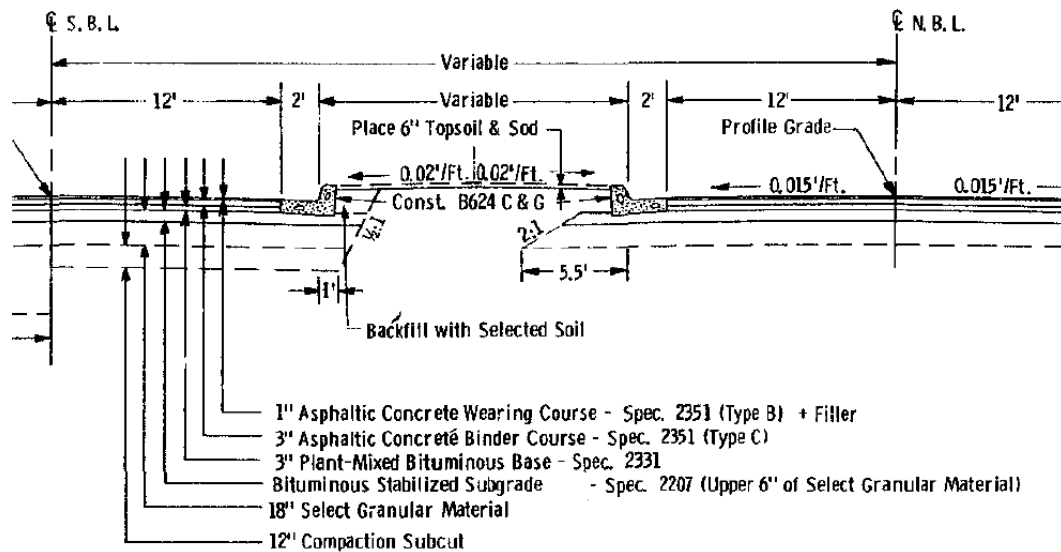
TH 47 mainline typical section (1964 construction plan)
